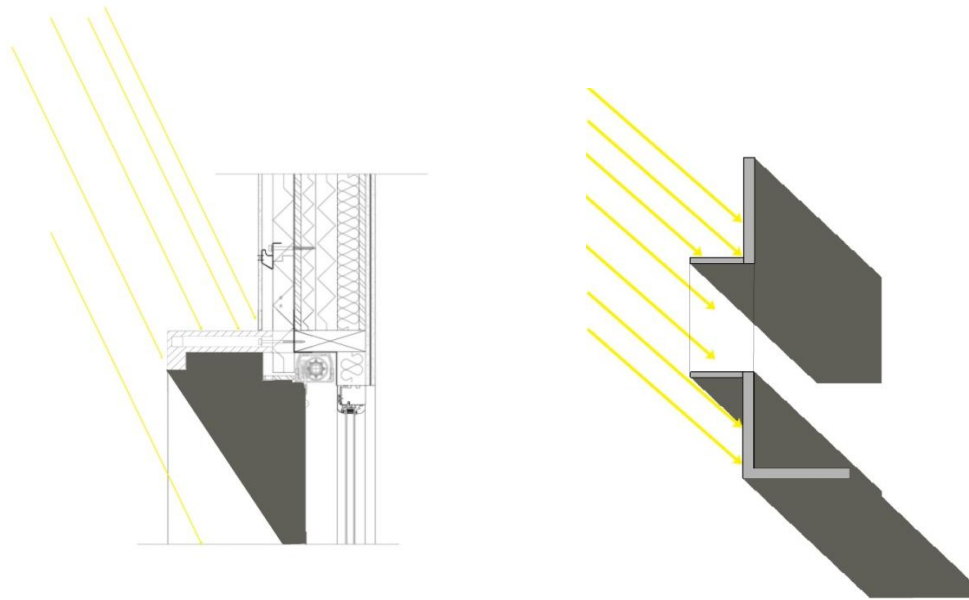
80. Left: shadows in vertical section, Right: shadows in horizontal section
